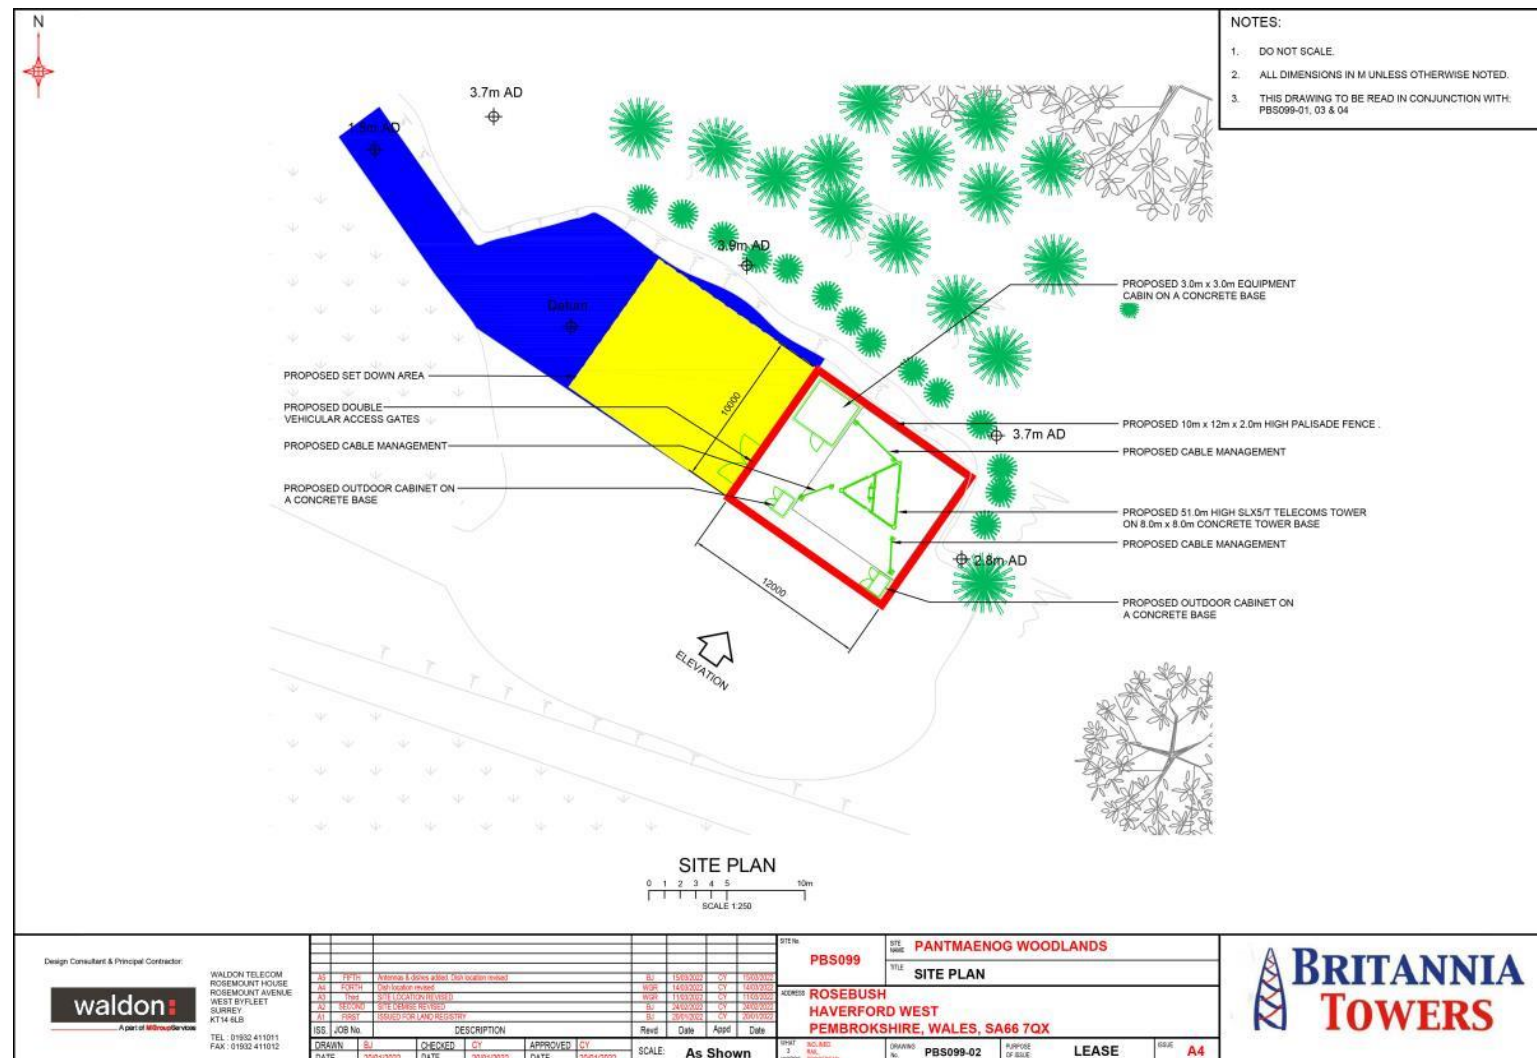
Proposed layout of development elements. Plan provided by the client, not reproduced to original scale.
